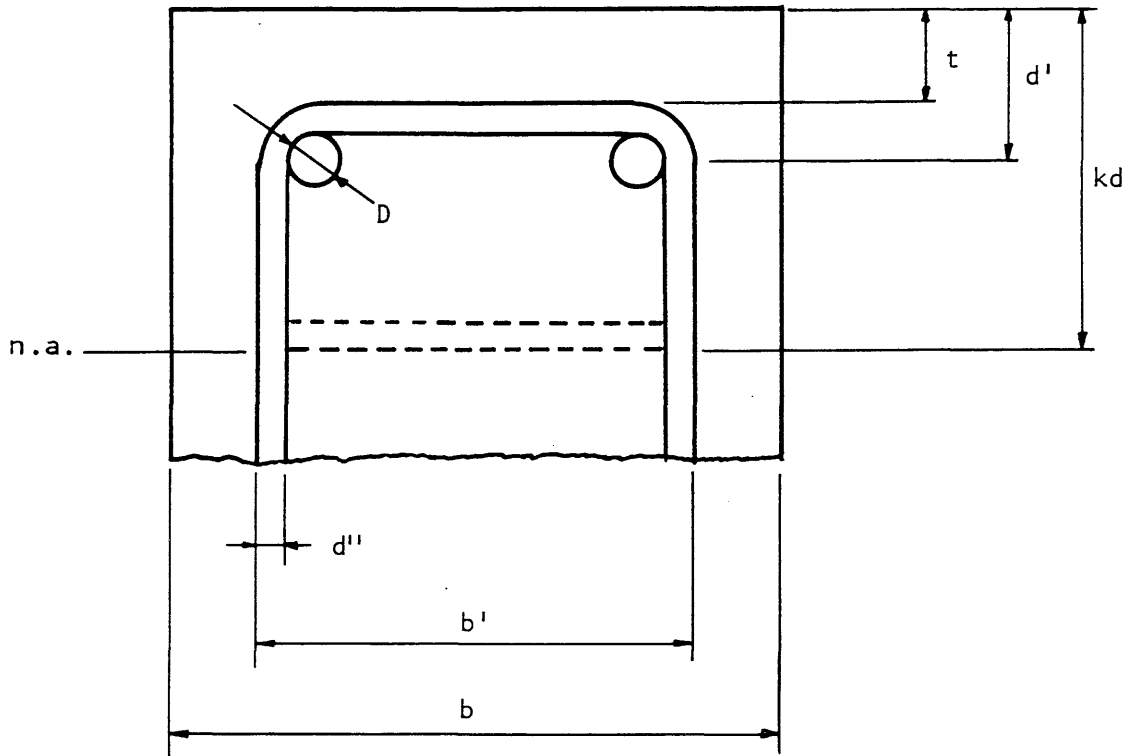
Geometrical parameters of the compressive zone for a reinforced concrete beam.
